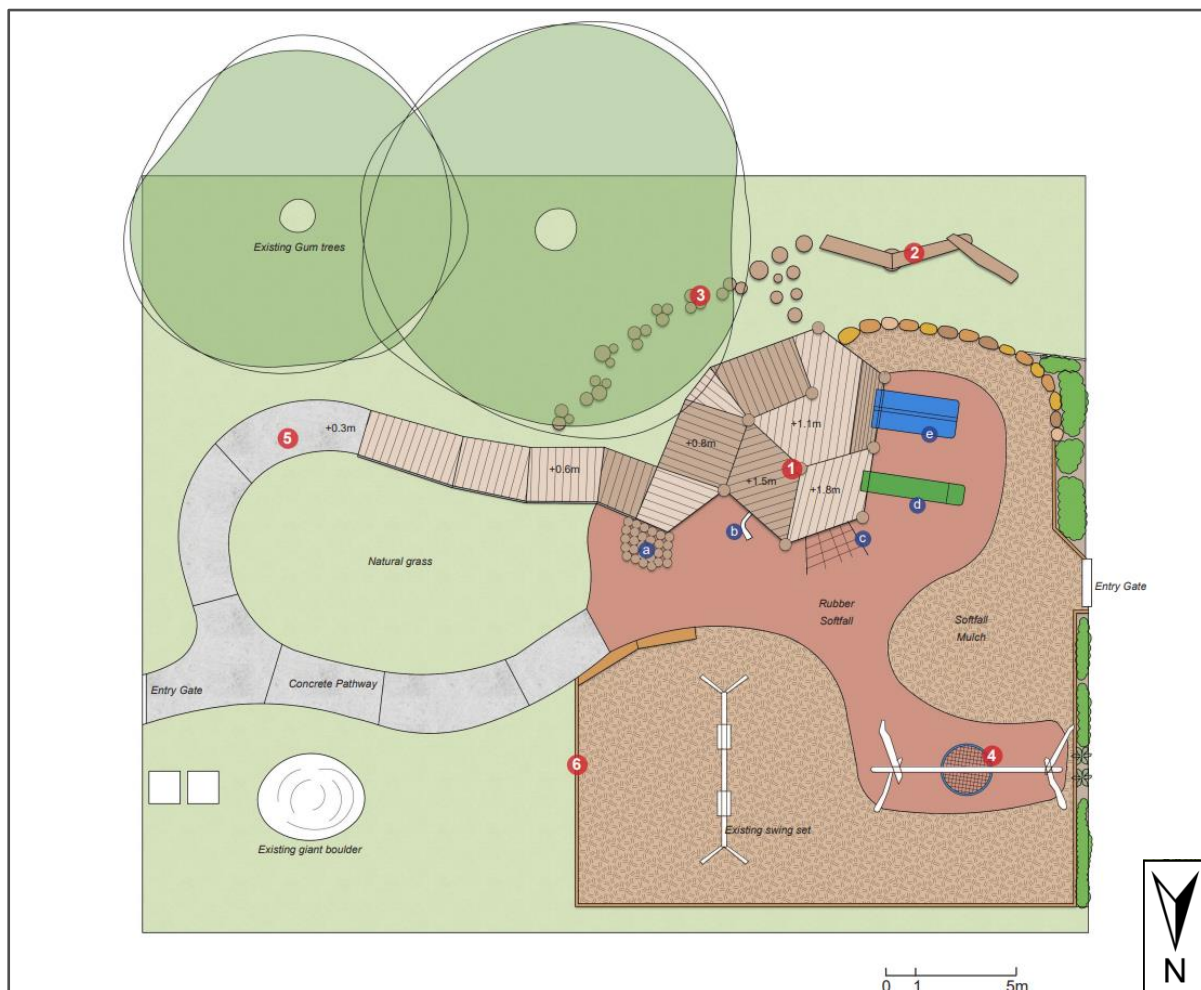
| Proposed Nature Play Playground Design (Source: Applicant's documentation)
